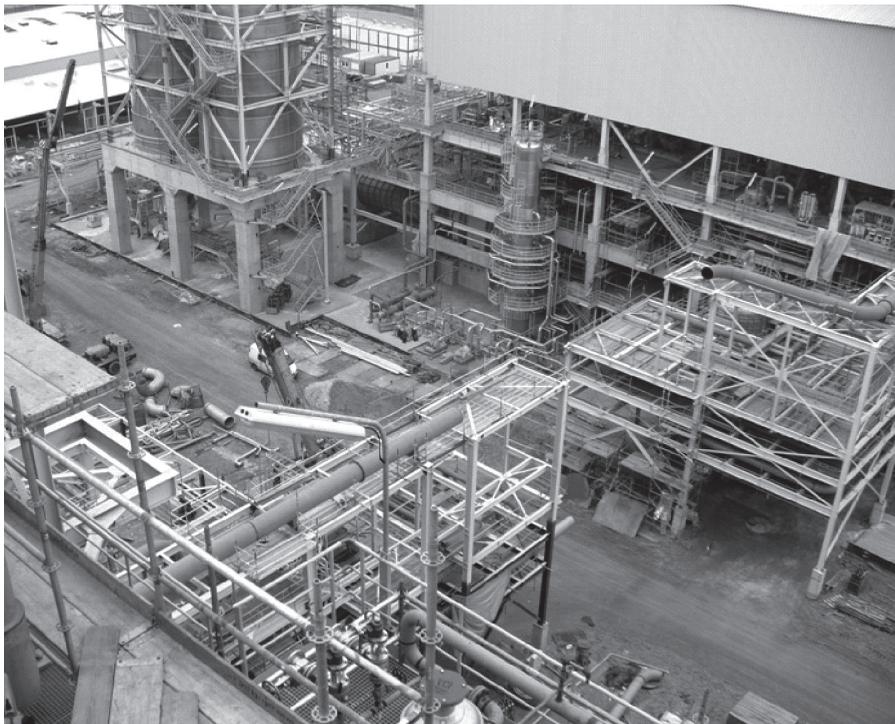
Example of structural use of stainless steel in Poland – pipelines and tanks for terephthalic acid production line (under construction), ANWIL S.A., Włocławek, Poland (source: [www.euroweld.pl](http://www.euroweld.pl))
